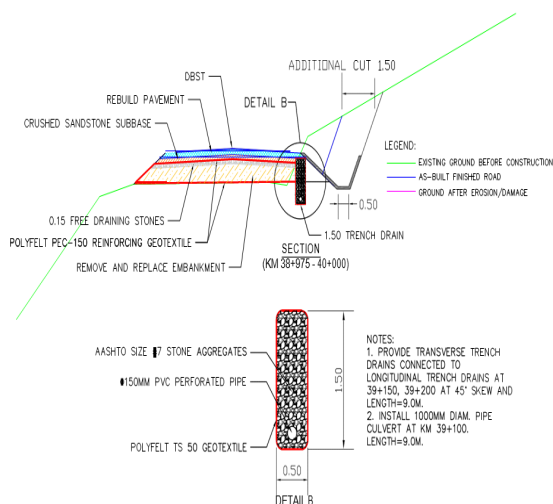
Remedial works for pavement failure at KM 39 to 40 (Case 2).
